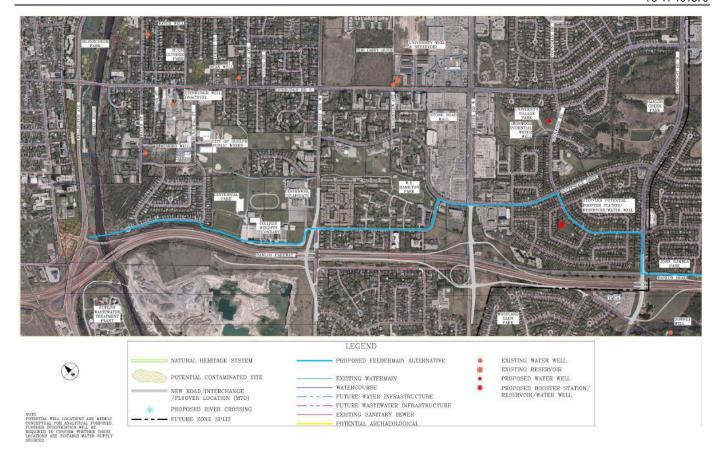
Wellington-Clair Feedermain North Section – Preferred Alternative 2A
